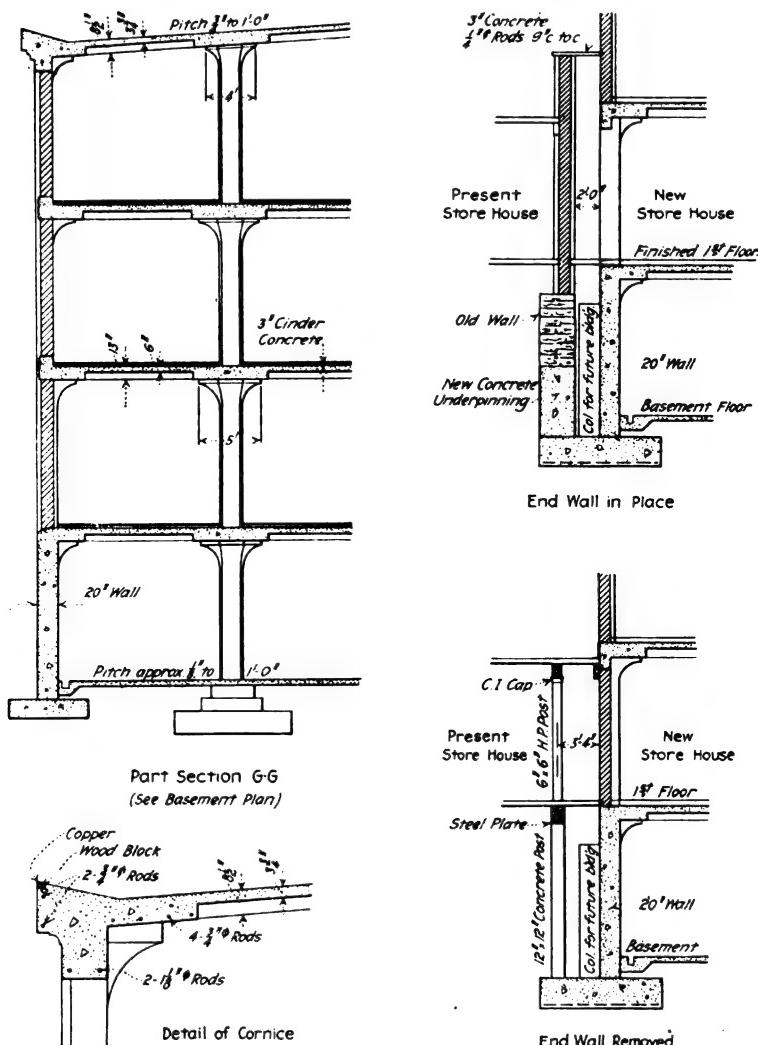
E.—Winchester Repeating Arms Co.'s building, New Haven, Conn.
